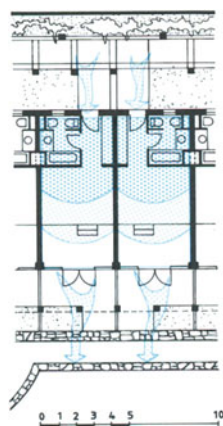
Plan of guest room module showing cross ventilation and daylighting
